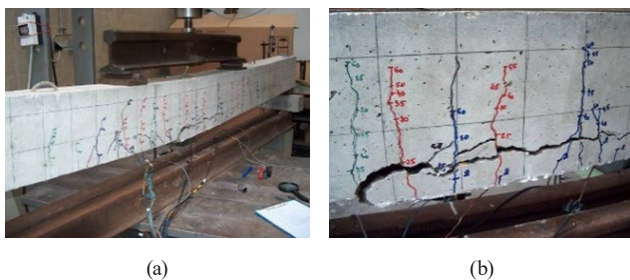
Crack distribution at beam B-G4 (bypassing 40∅): (a) general view, (b) detail view
